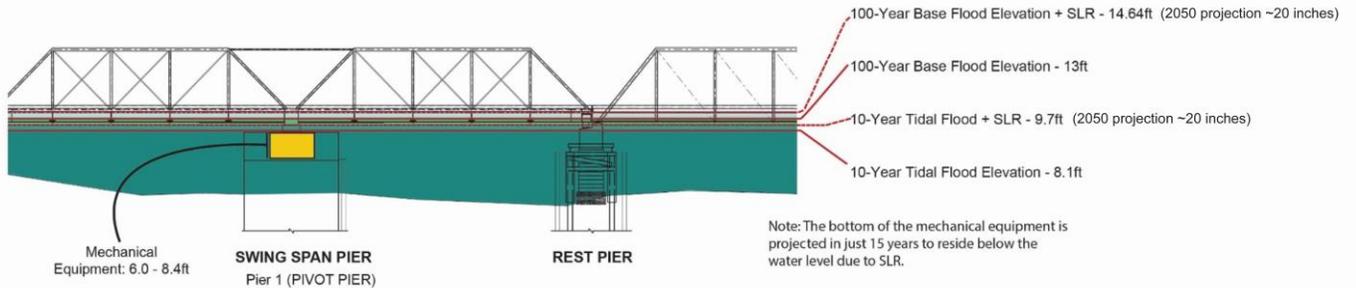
No Build, Conservation, Rehabilitation Alternatives - Flood Elevations with Sea-Level Rise
